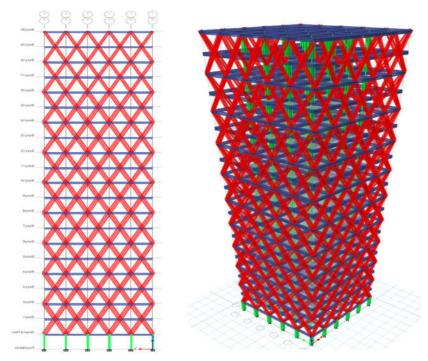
64 -degree diagrid structure elevation and 3D extruded view
